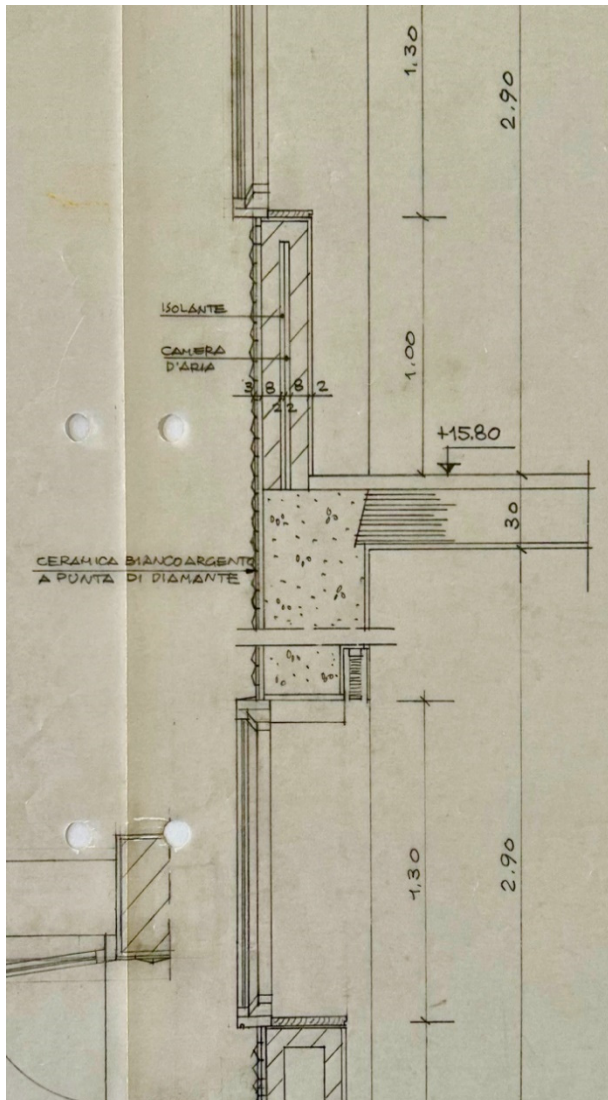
Studio Ponti Fornaroli Rosselli, Façade detail. Parish residence facing the church square, 28th April 1961, scale 1:20 (part.) © CSAC Centro Studi e Archivio della Comunicazione, Università degli Studi di Parma, Fondo Gio Ponti.
